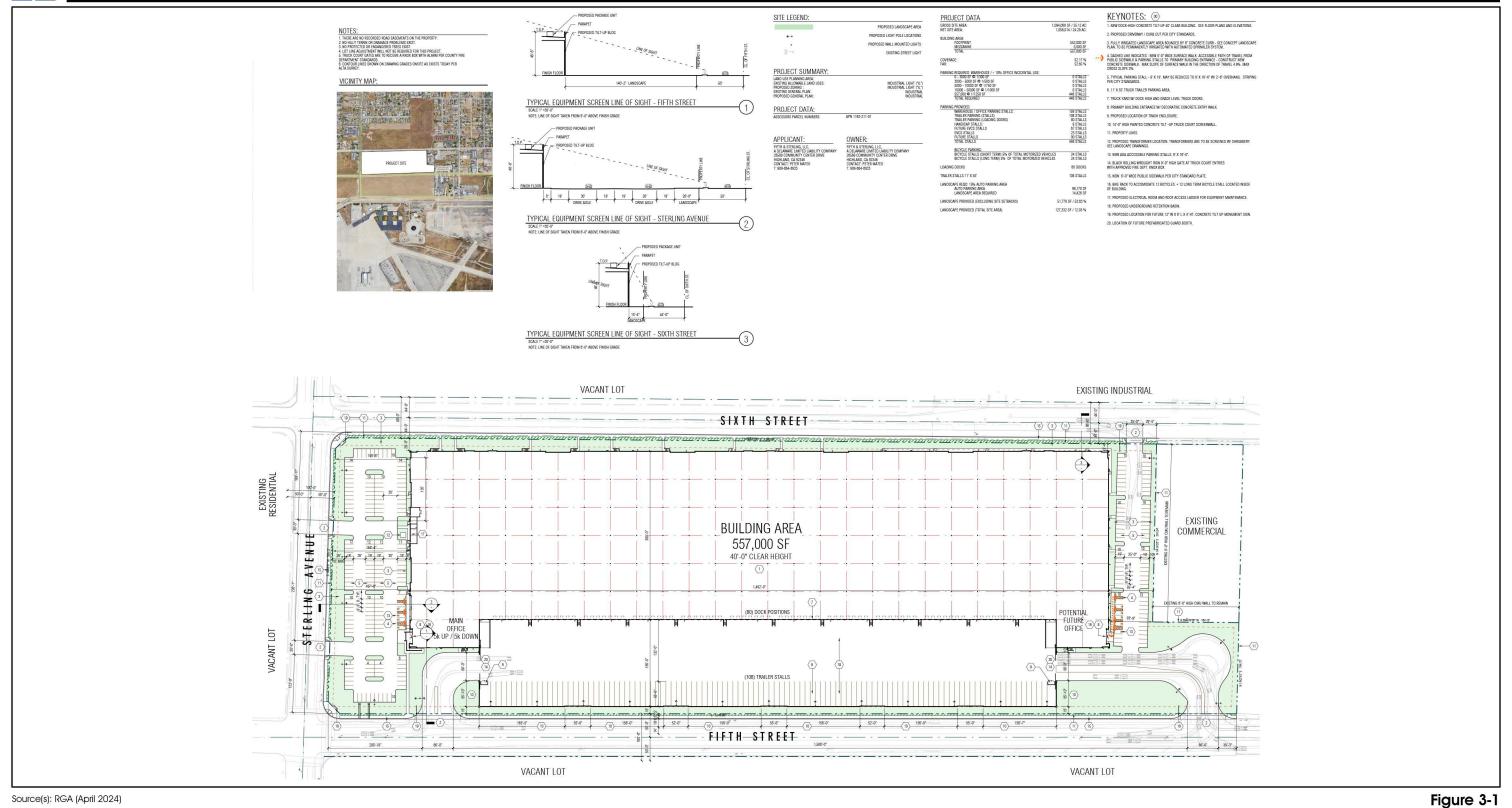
, Development Permit Type-D No. 23-13 Overall Site Plan, depicts the overall site plan proposed by the Project Applicant. As shown, DP-D 23-13 would allow for the development of the 25.15-gross-acre Project Site with a proposed 557,000 s.f. warehouse building and associated site improvements. The building is designed to contain up to 557,000 s.f. of interior floor space, which would include up to 552,000 s.f. of ground floor warehouse space and 5,000 s.f. of mezzanine space. While the ultimate user/tenant of the proposed building is not known, the Project Applicant anticipates that the building would be occupied with high-cube transload warehouse uses.
